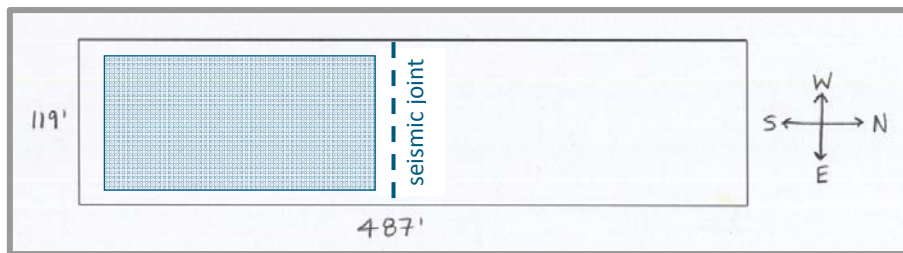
Plan Dimensions (N.T.S.) and Cardinal Directions
